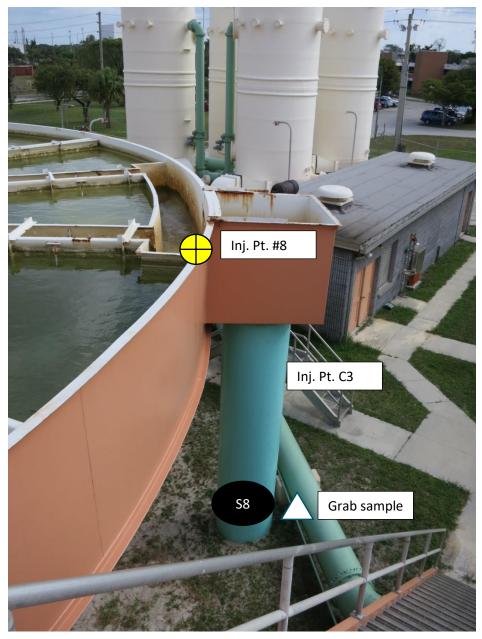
Discharge Box and Pipe from Softener No. 03 (typical arrangement for all softeners)
